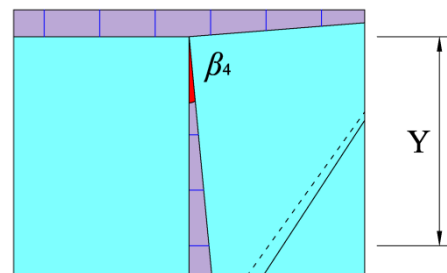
Rebar extension in crack at yield-line intersection
